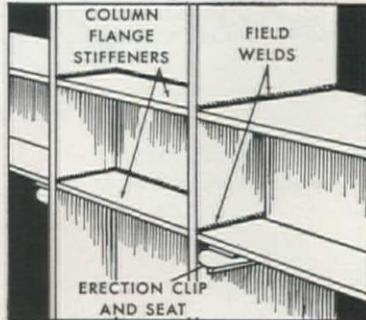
Typical Beam-to-Column connection, simplified by welding, eliminates costly angles to speed erection.
